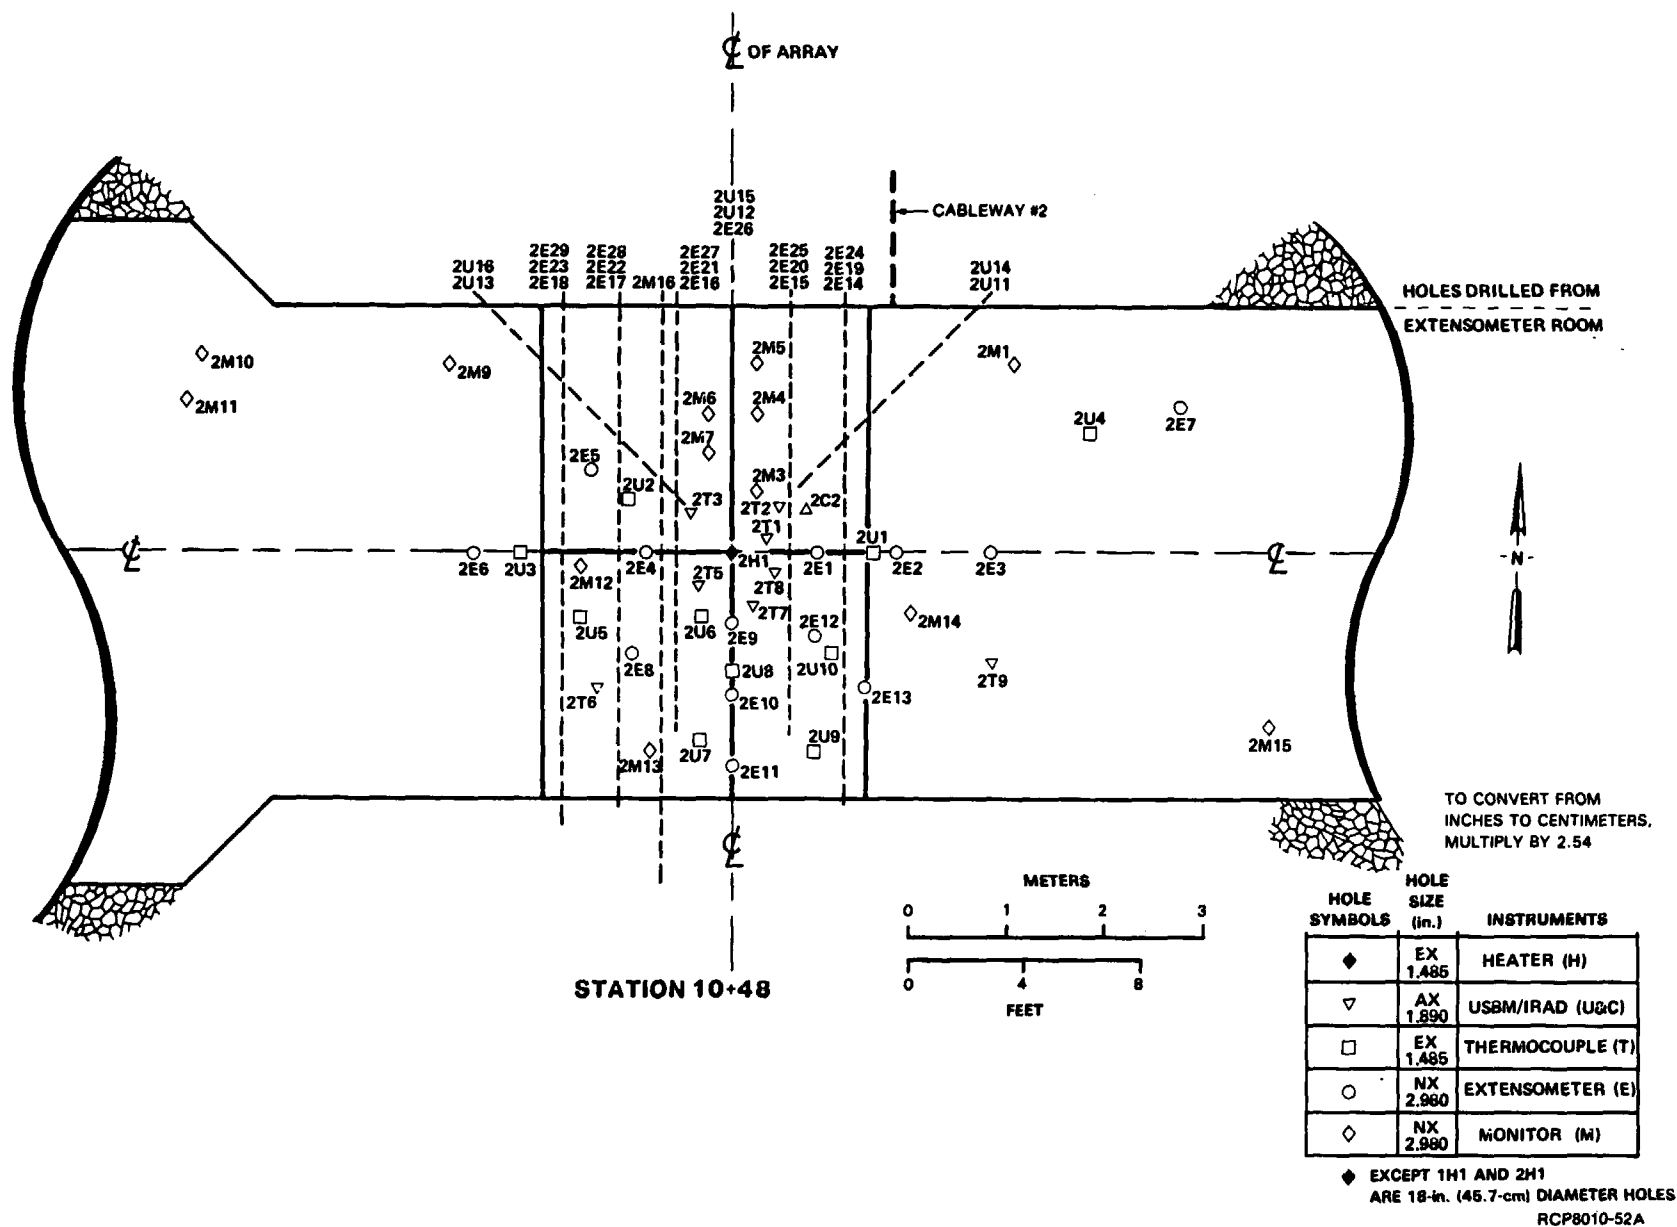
Plan View of Boreholes Drilled for Full-Scale Heater Test No. 2.
